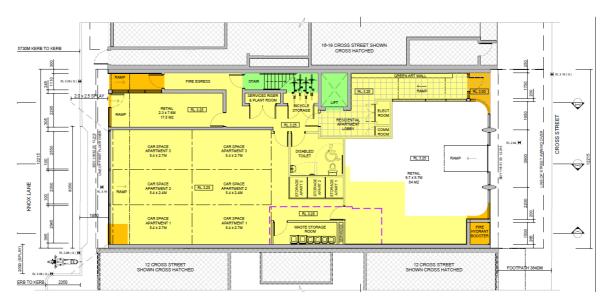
Amended mirror reversed ground floor plan showing addition of retail space facing Knox Lane and reduction of parking to three sets of tandem car spaces.
